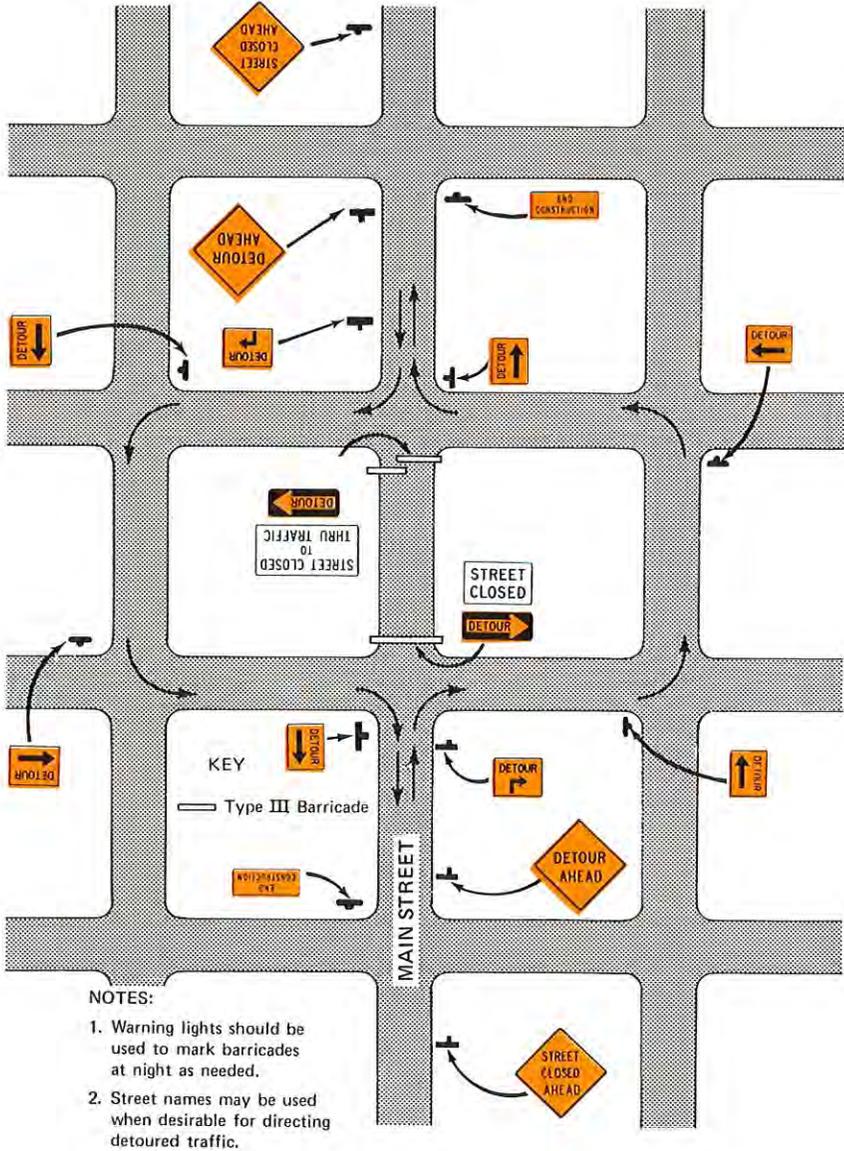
Typical application—detour signing for street construction project in a street grid.
